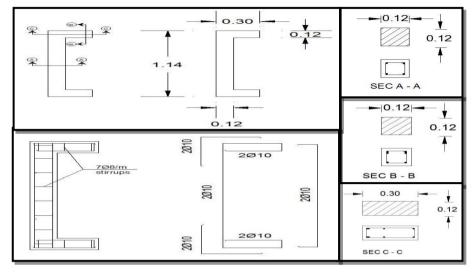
Concrete Dimensions And Reinforcement Details For Columns (C1, C2, C3, C4, C9, C10, C11andC12)
